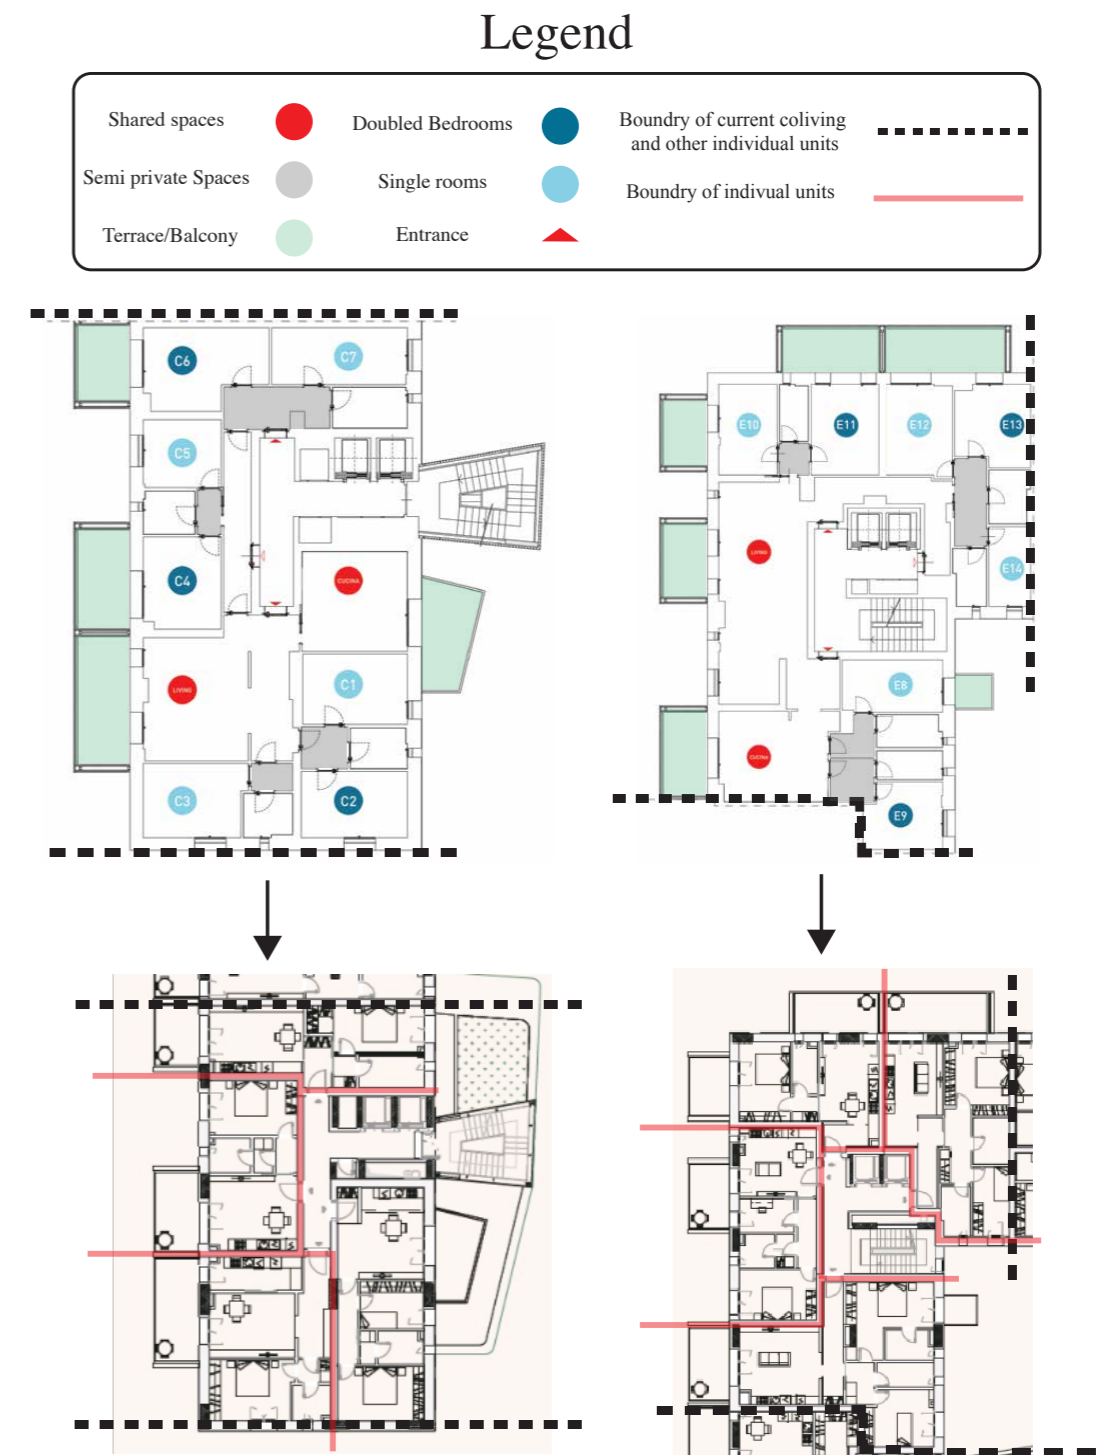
Floor plan of coliving C and E and the other plan Typology of the different floor
